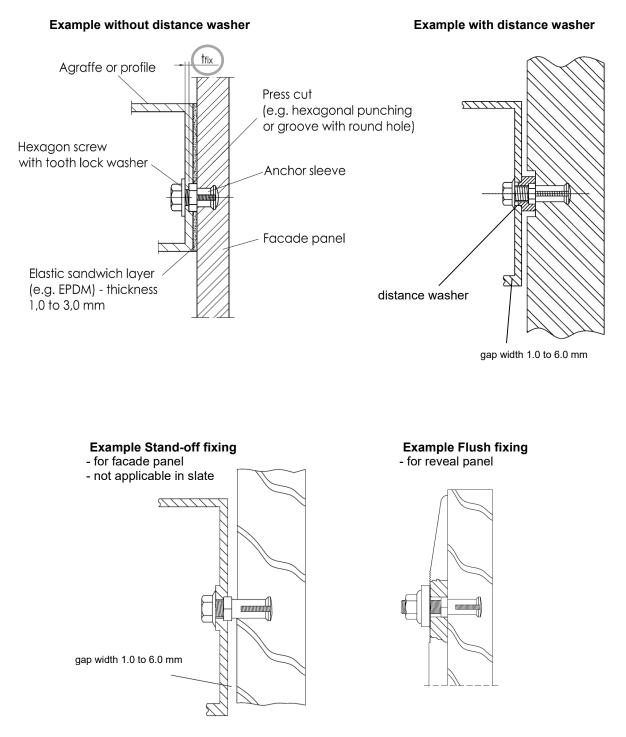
FAÇADE PANEL SYSTEM INSTALLED WITH KEIL UNDERCUT ANCHOR KH USING DISTANCE WASHER AND STAND-OFF FIXING
